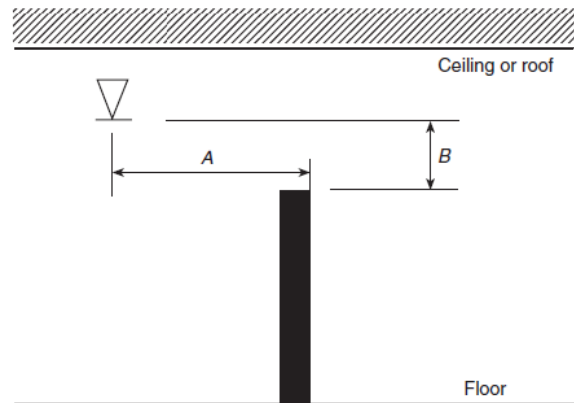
Suspended or Floor-Mounted Obstruction in Light Hazard Occupancies Only (SSU/SSP).
